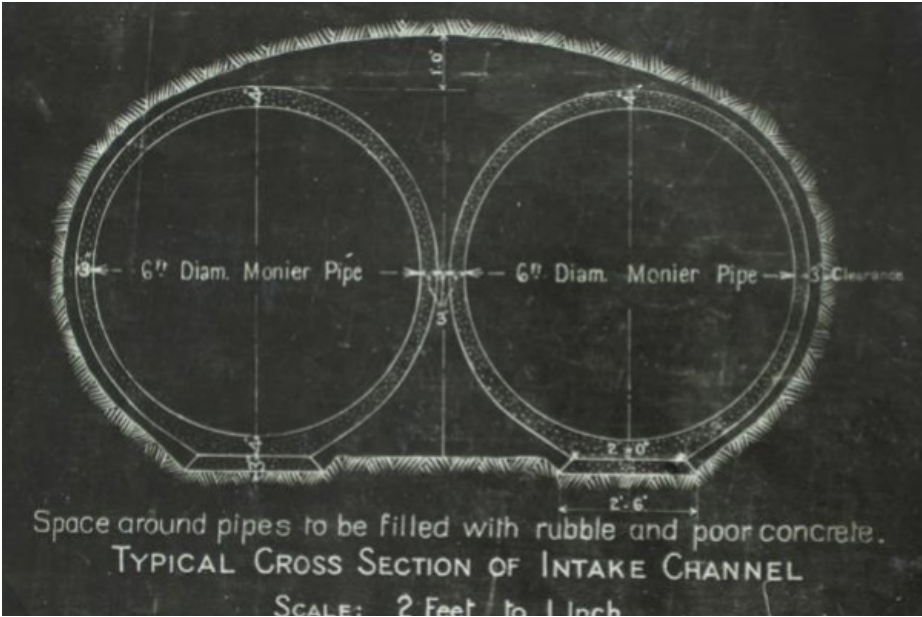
Typical Cross section of intake channel for Ultimo power house water conduits (Source: State Rail NSW, item 364/49)
